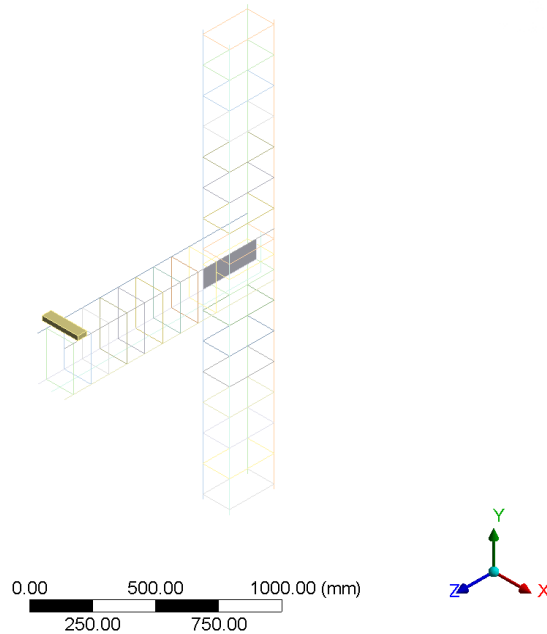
Modelled Beam-Column Joint (steel plate is connected internally)
